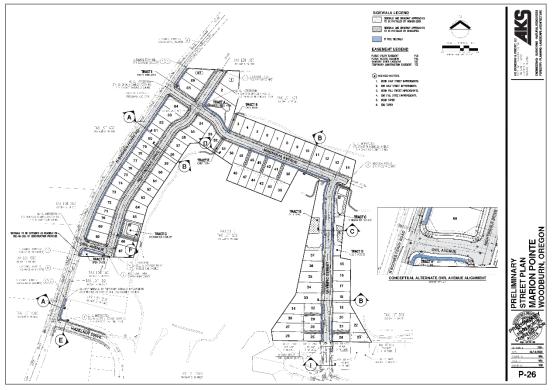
Site Plan Sheet P-26 Sidewalks (blue: min 8 ft wide); see Attachment 103 for full size
